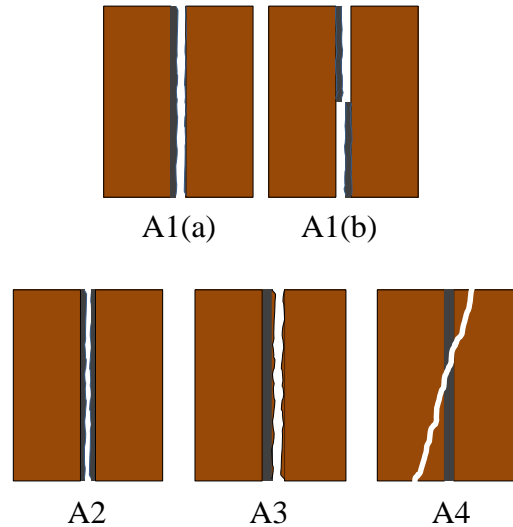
Triplet test failure modes: A1- joint failure on a face or divided between two faces, A2 – shear mortar failure, A3 – shear block failure, and A4 – crushing and/or splitting in blocks (UNI EN1052-3)
